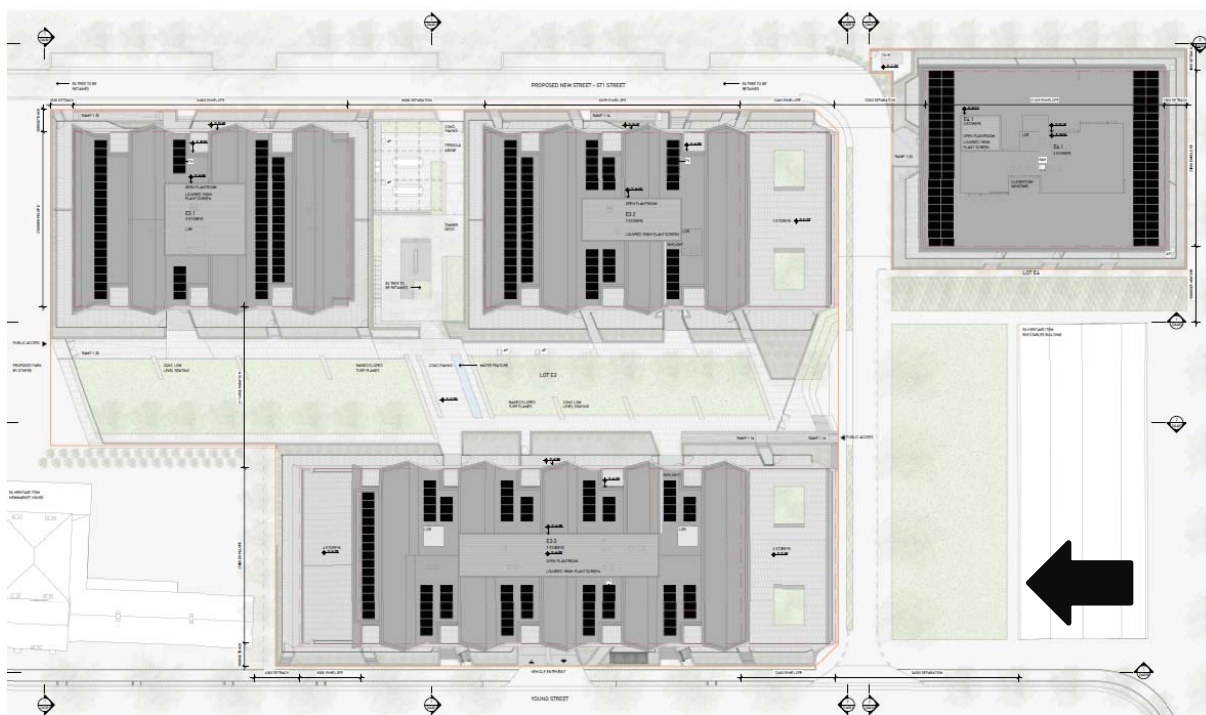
below shows the siting and numbering of the proposed buildings across site. The proposed development comprises the following works:
